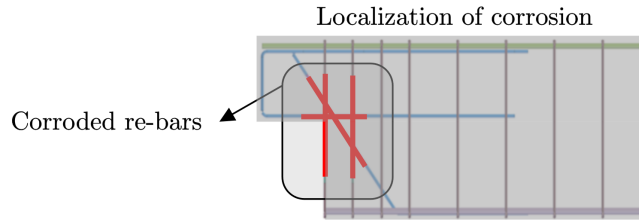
Corrosion localization in the reinforcement layout of the half-joint by Desnerck et al.
